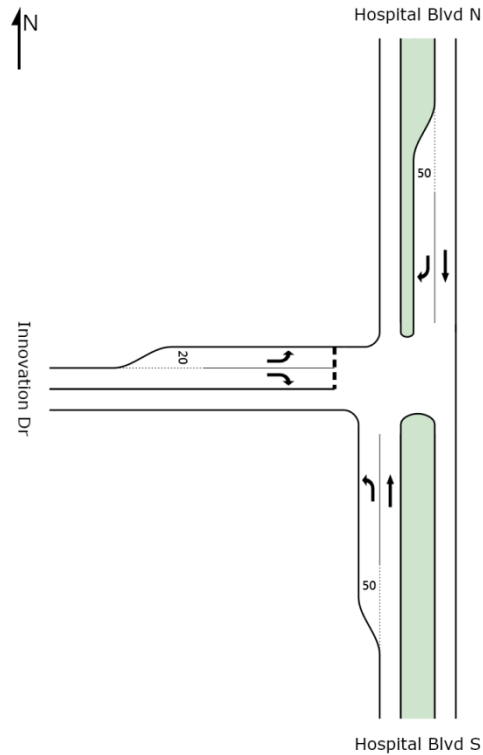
Hospital Boulevard / Innovation Drive – SIDRA Intersection Layout
